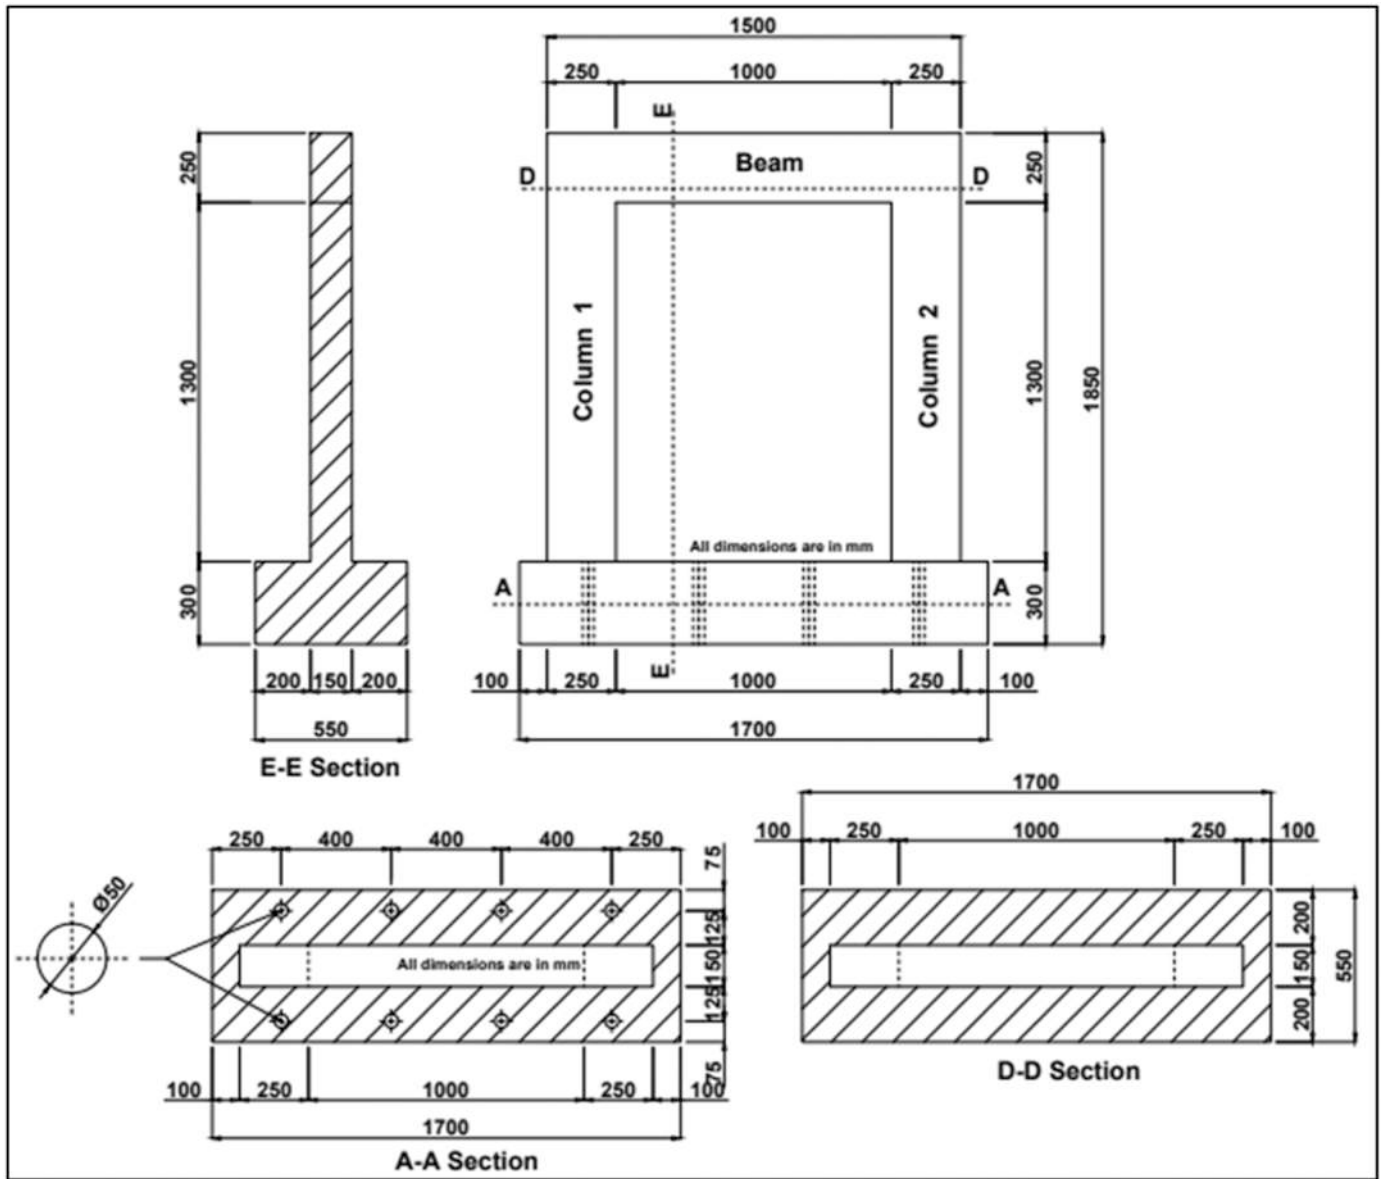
Formwork layout of the reinforced concrete frame test specimens.
